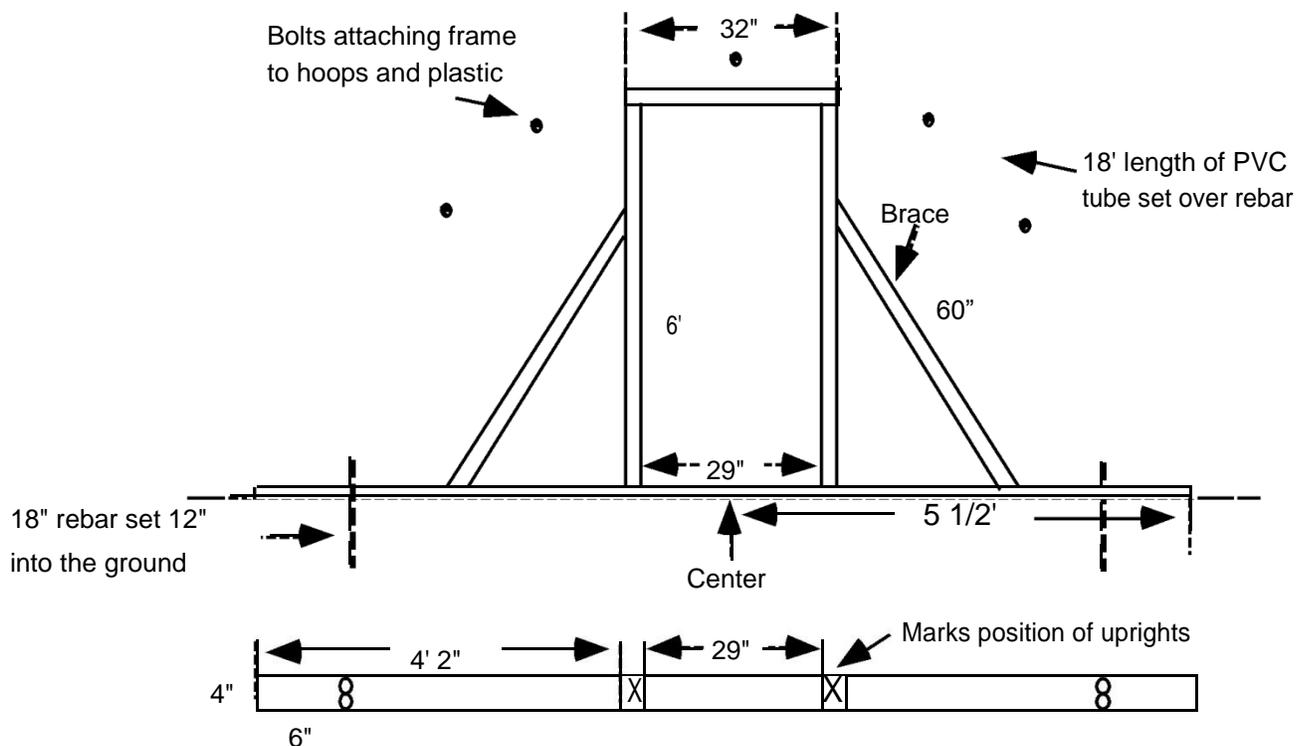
Top view of bottom piece with two holes drilled 6" from each end and door uprights marked, and front view of the hoop house end frame.
